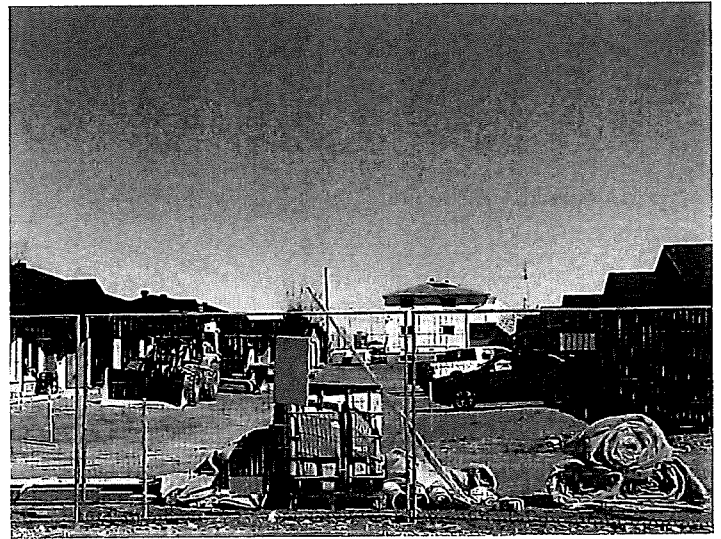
View of the Existing Building Facing East (from the west end of the Row Dwelling Complex)
